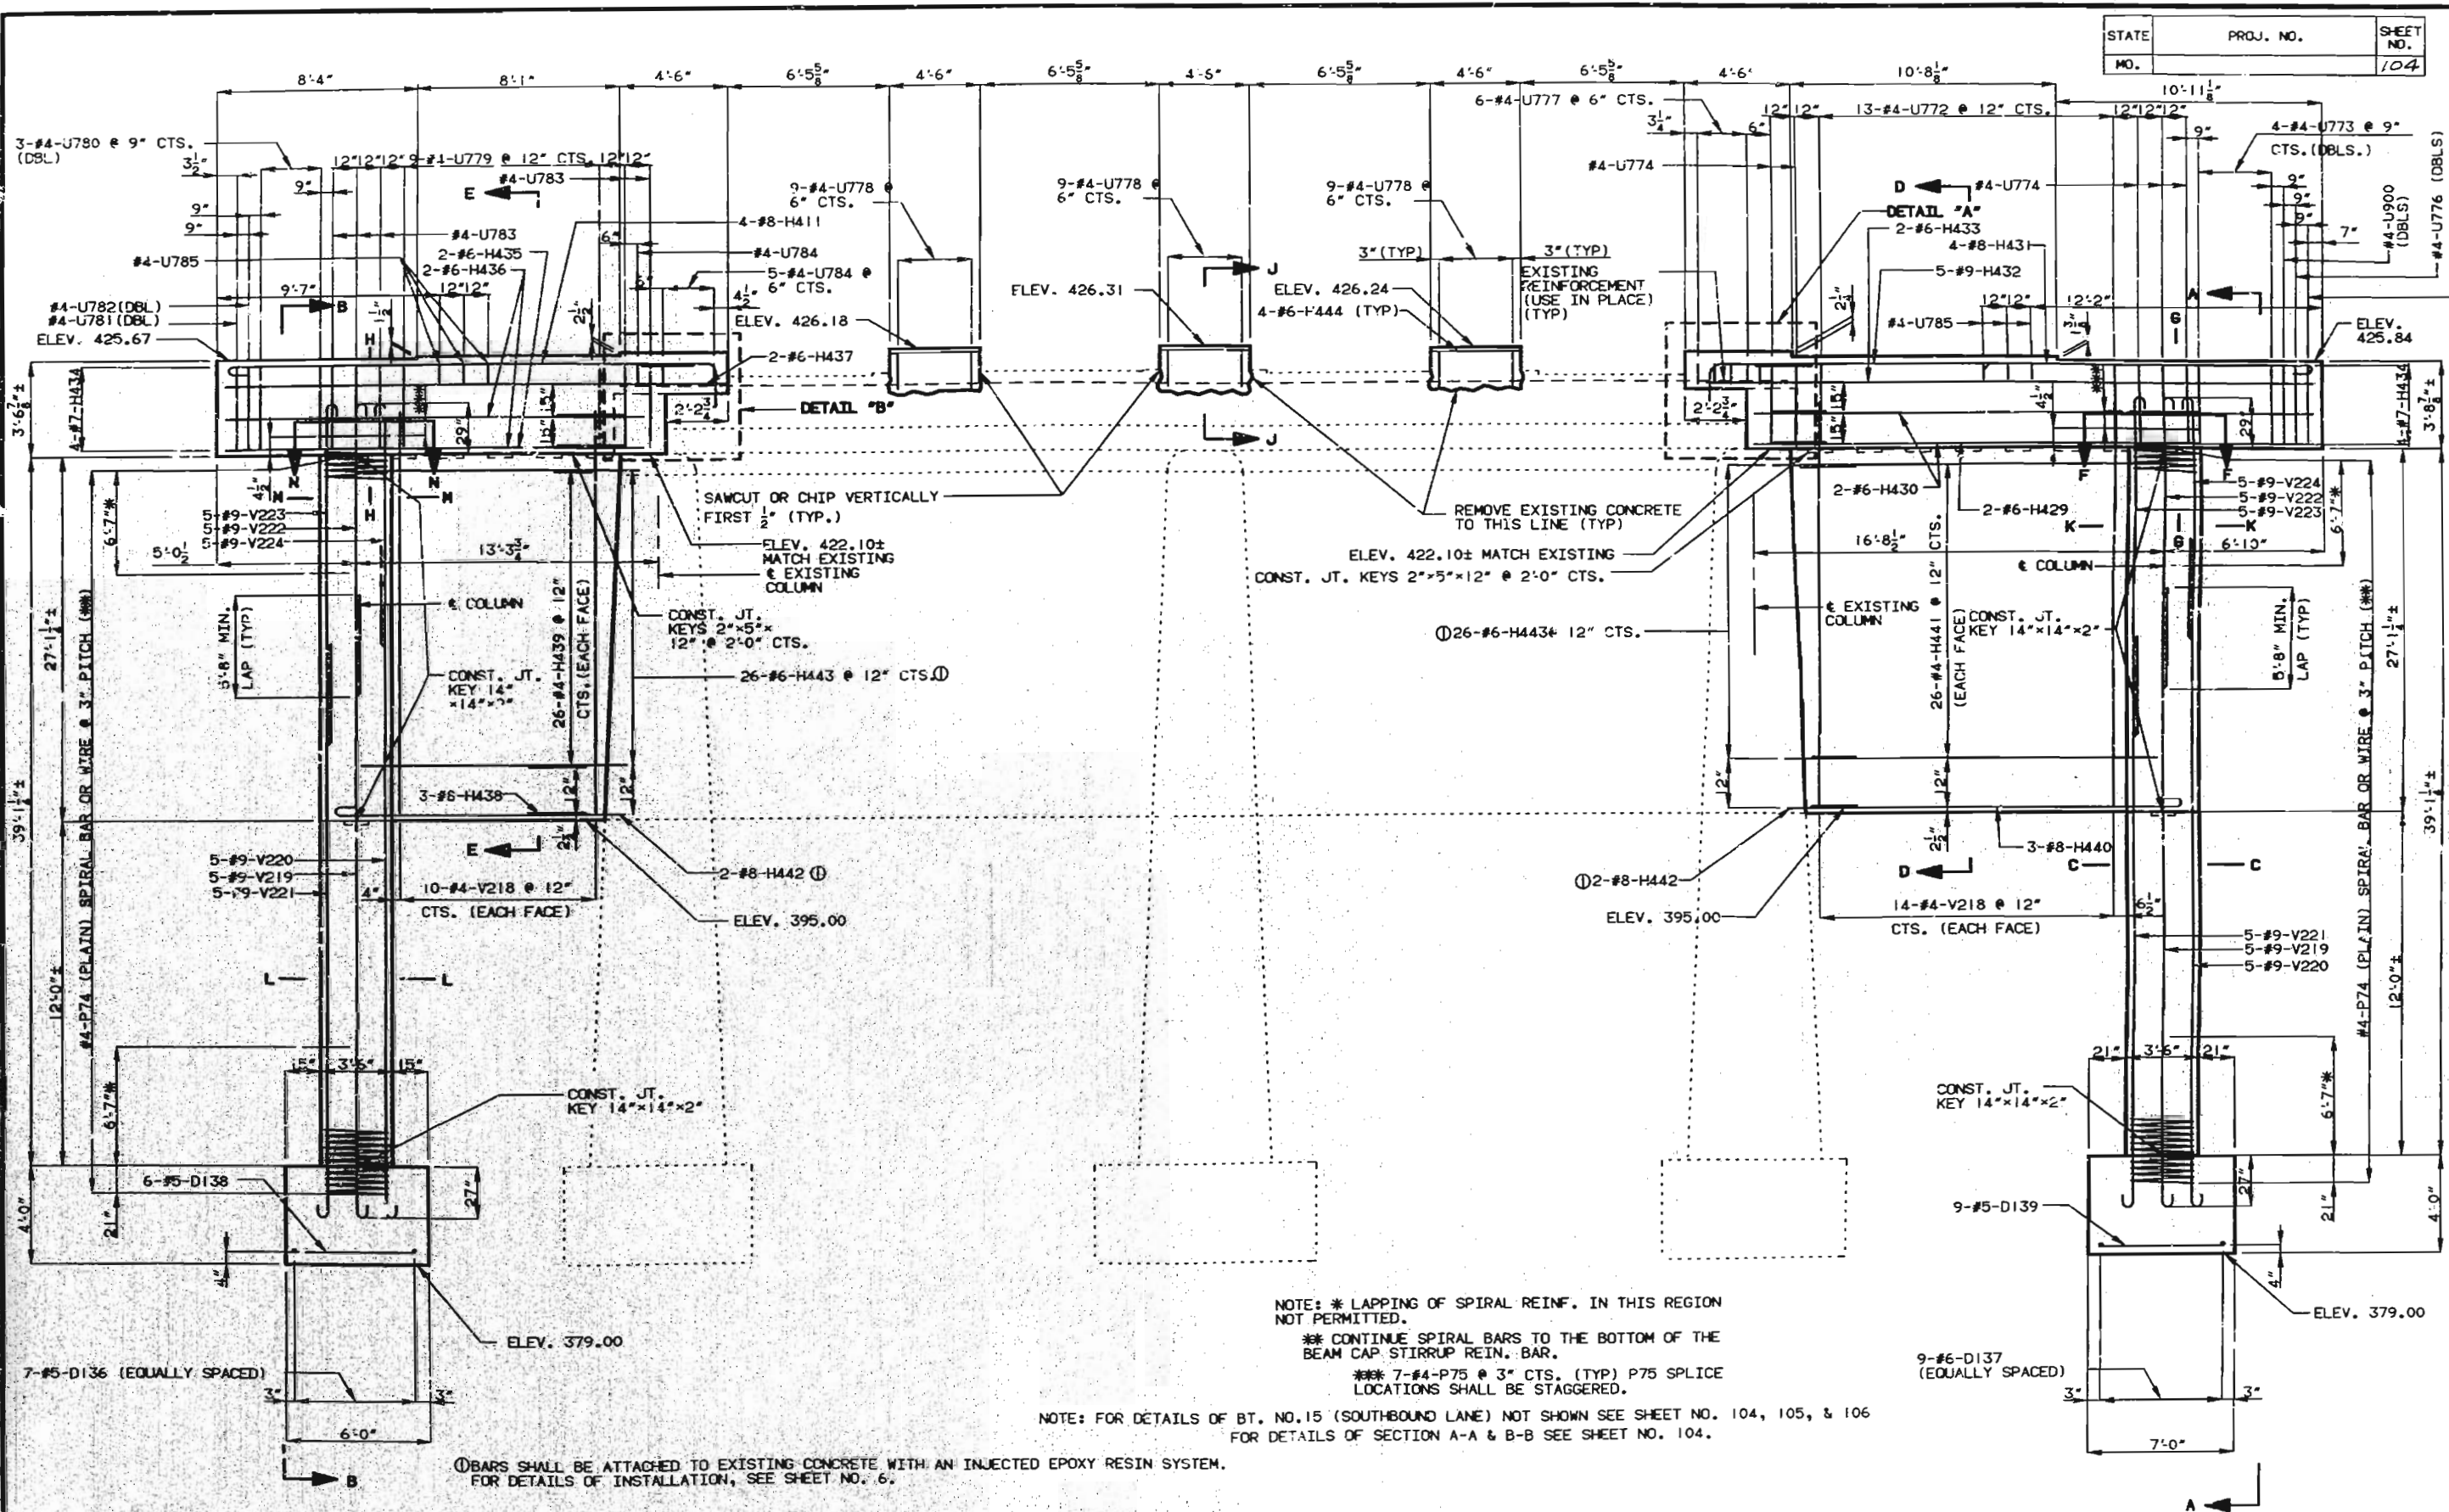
DETAILS OF INT. BENT NO. 15 (NORTHBOUND LANE)
